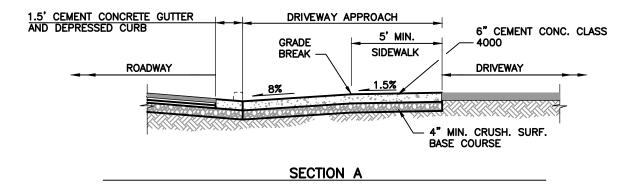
TYPE 1 DRIVEWAY APPROACH
